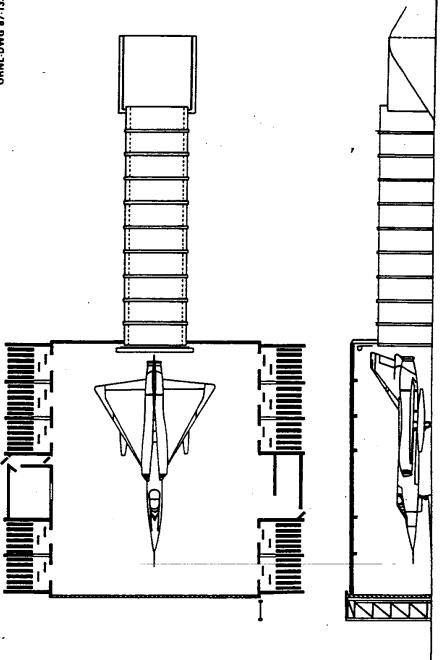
Sketch of configuration used for the testing of an engine installed in an F-106 aircraft.
